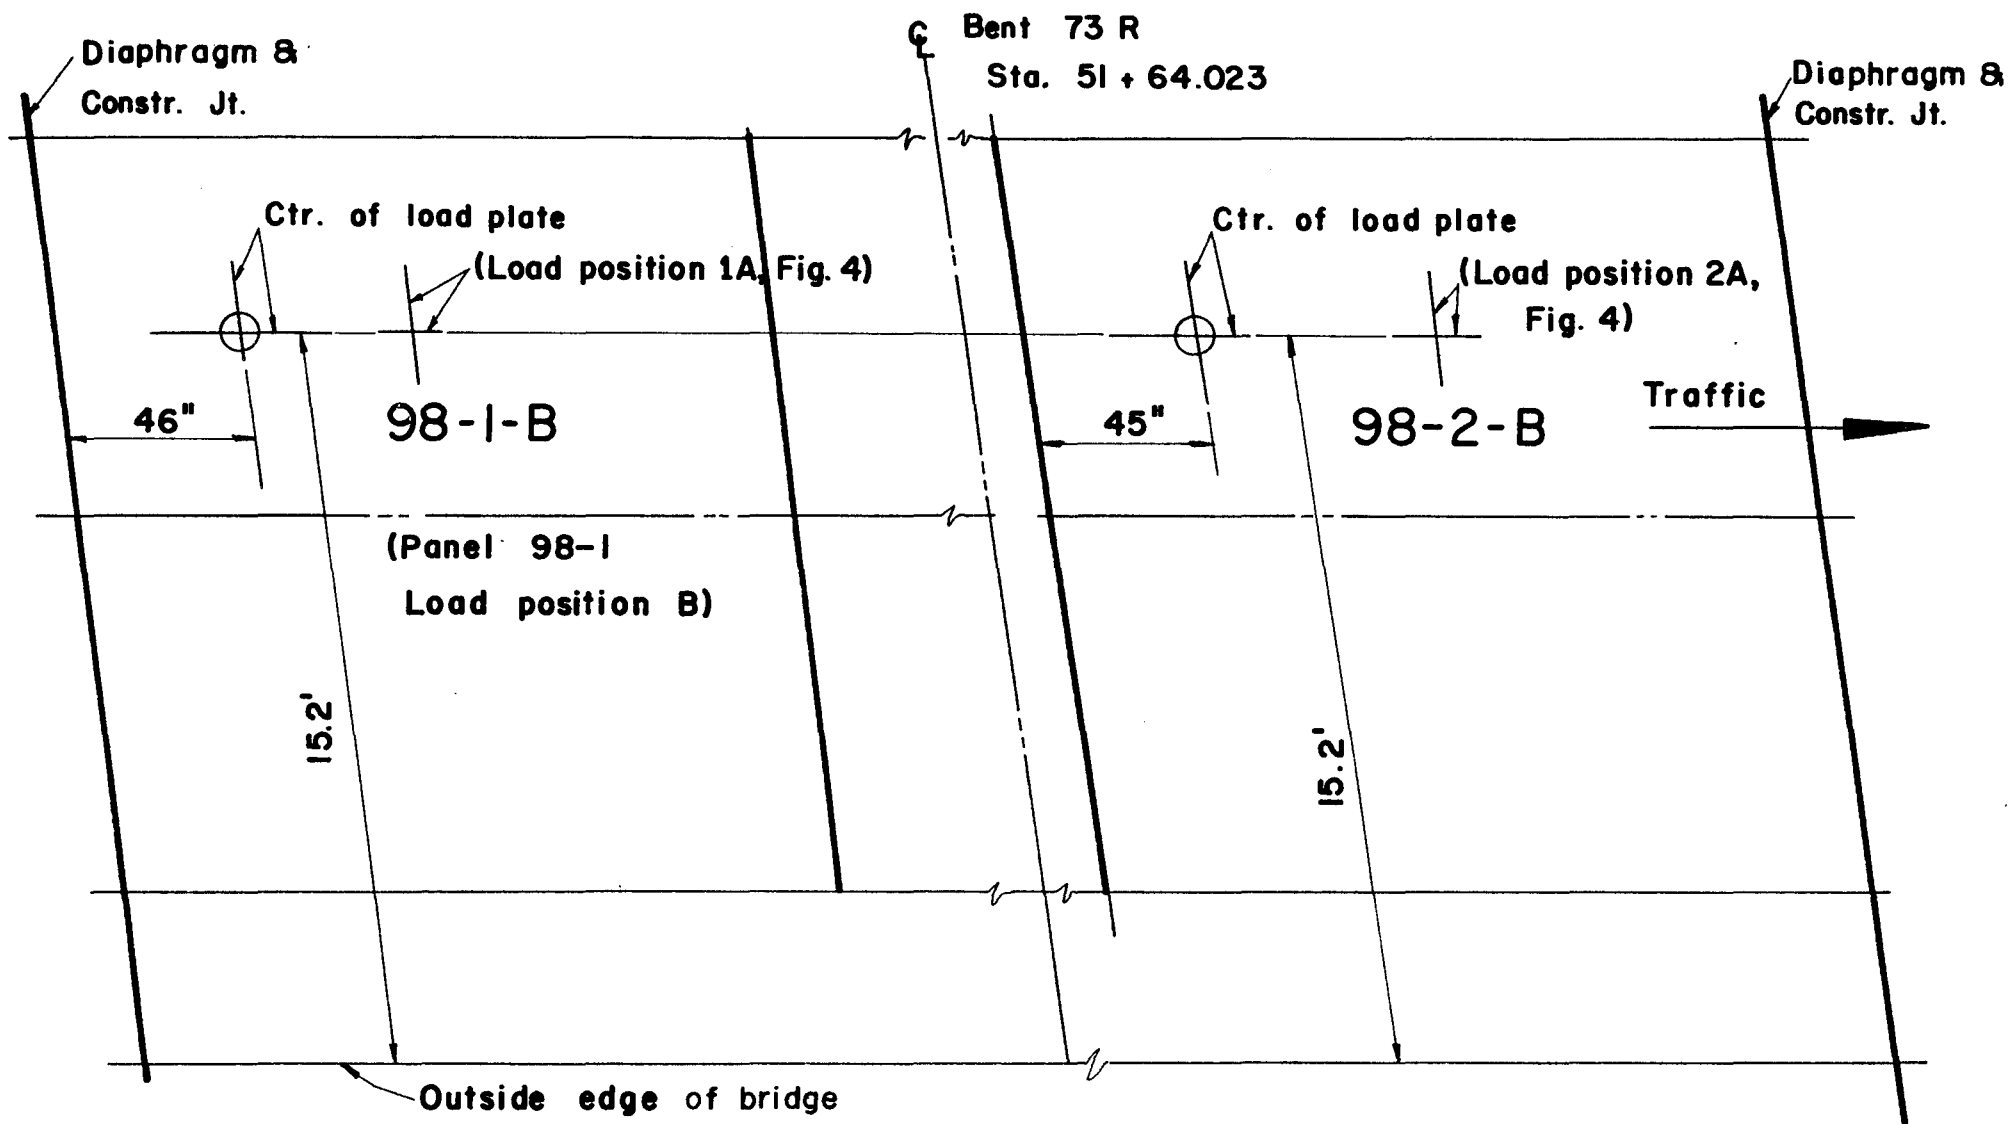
STRUCTURE 98, ADDITIONAL LOAD POSITIONS, JUNE /75 TEST
